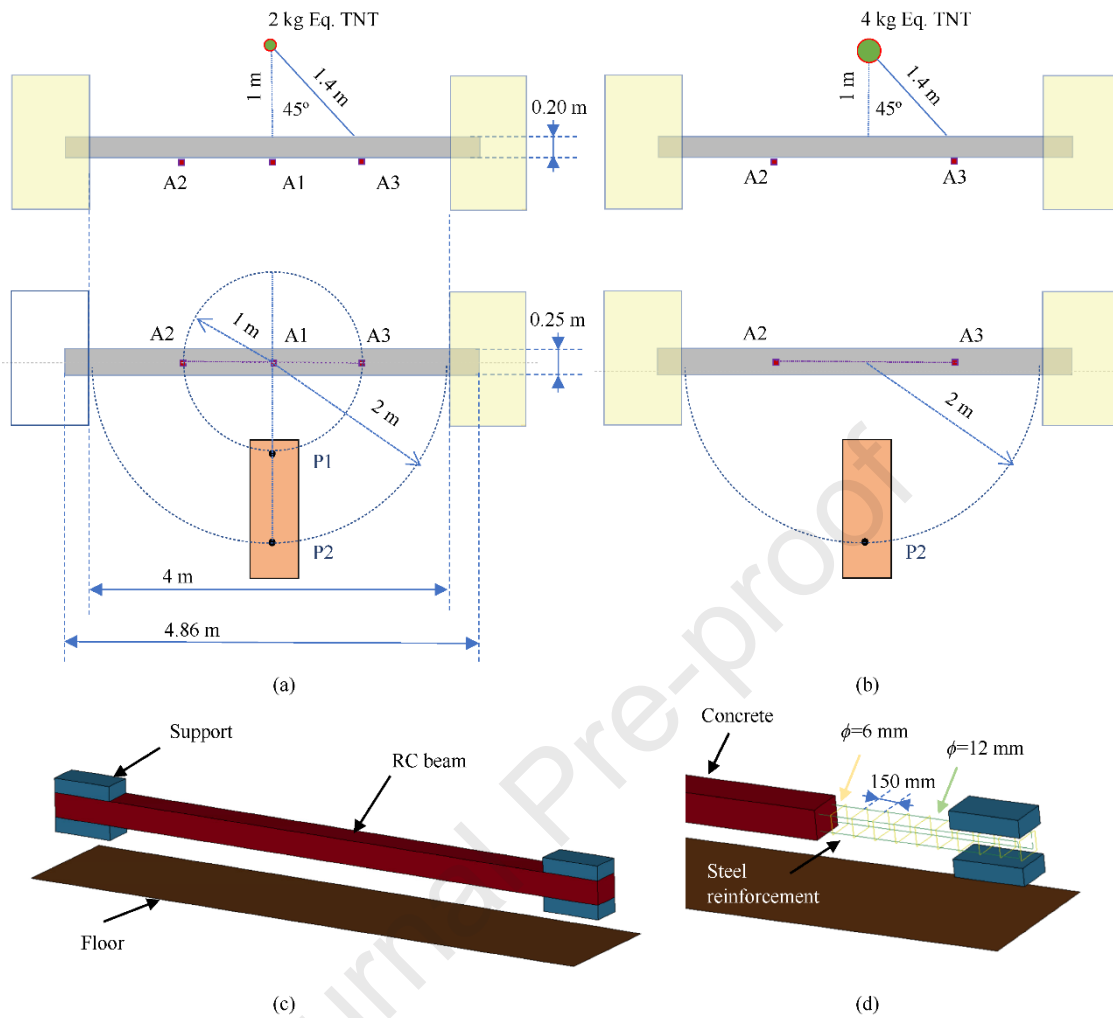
Experimental set-up of structures: (a) Tested beams B1, B2 and B3; (b) Tested beam B4; (c) Numerical model overview; (d) Detail of the mesh reinforcement in the numerical model.
